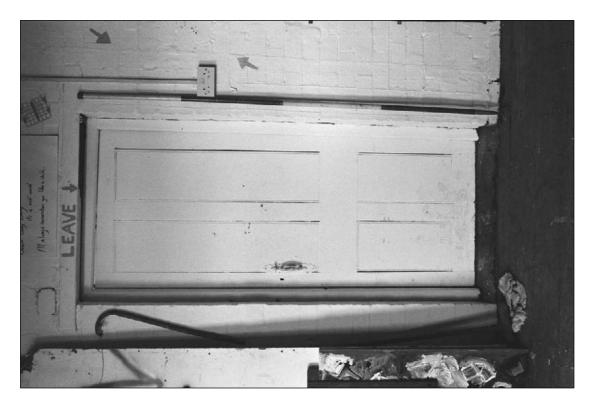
Detail of timber doorway leading to/from F6 east range, north wall of F9, south range (film 26.12)
